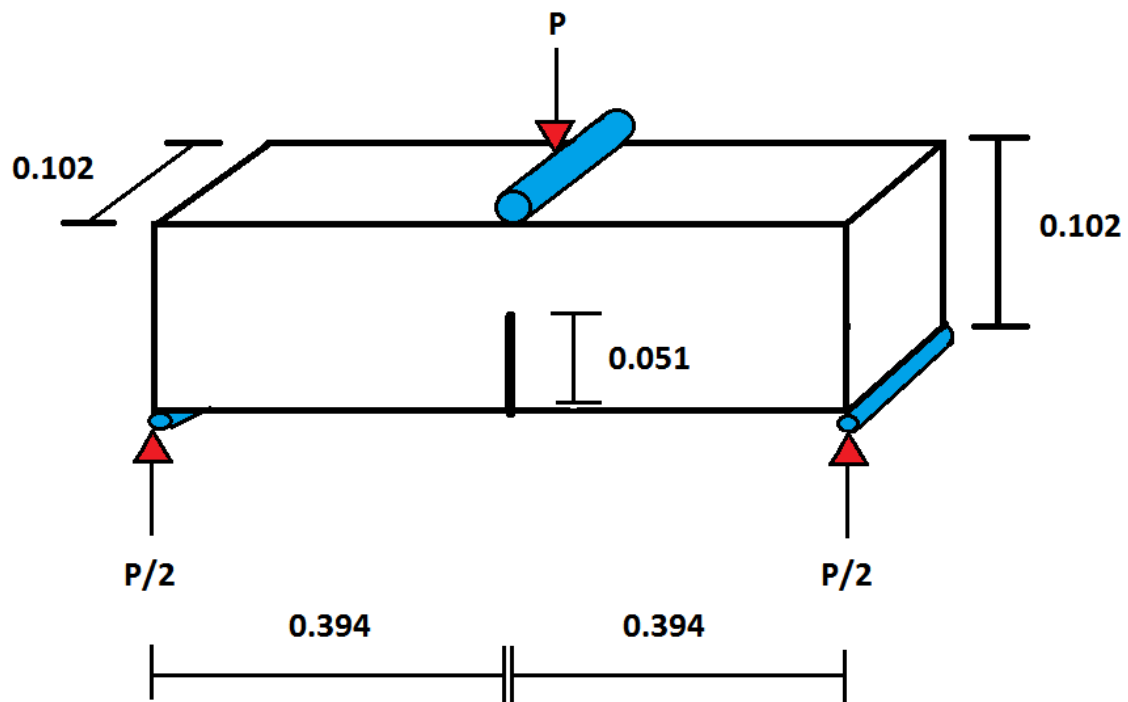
Single-edge-notched beam subjected to three point bending test. Geometry layout, (unit = m)
